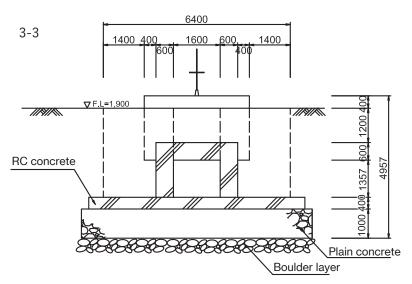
Example Cross-sectional Drawing of the Drain Gate³⁾
